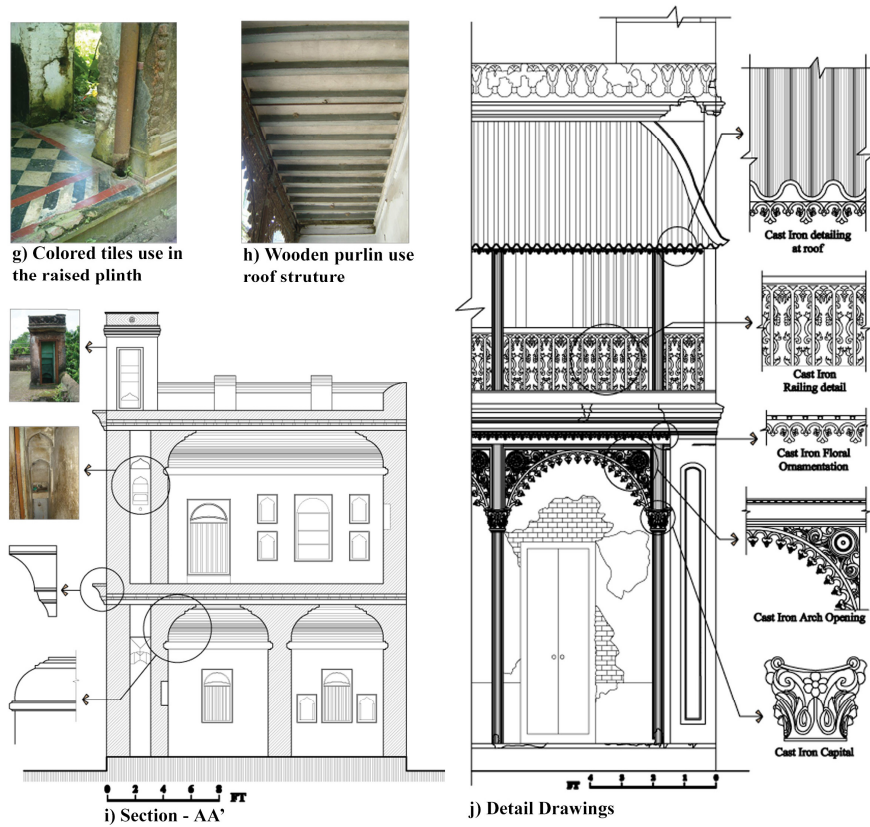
g) Colored tiles in plinth, h) Wooden purlin, i) Section-AA', and j) Detail Drawings of Building no. - 31; (Source: Field Study, in 2006 and prepared by the author)
